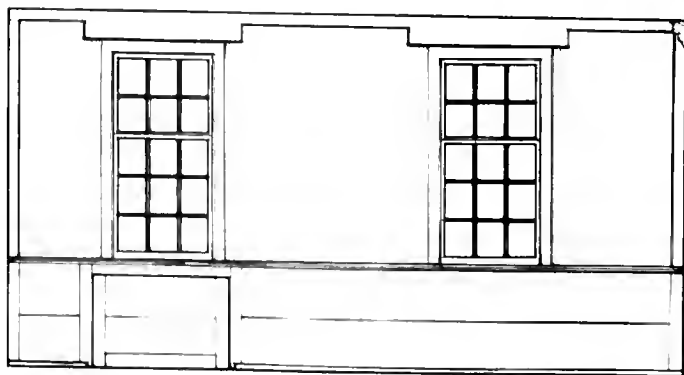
12d Living Room South Elevation. The two windows are centered on this wall above the horizontal beaded board wainscoting. The radiator cover under the window is designed to blend with the wainscoting. The plaster window jumbs are curved to meet the window trim. (Drawings surveyed and adapted from Okie prints)
